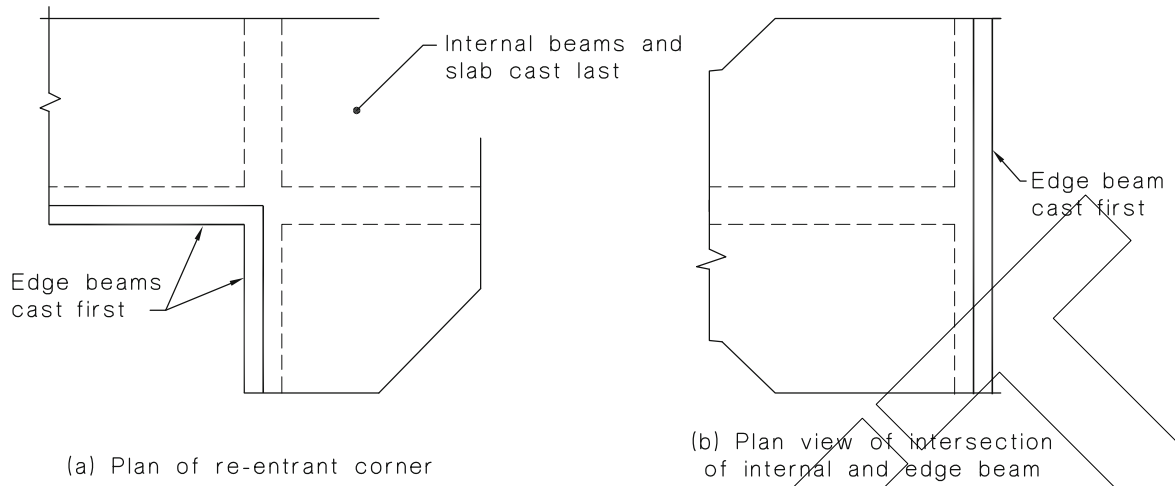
EXAMPLE OF INTERSECTION OF INTERNAL AND EDGE BEAM
